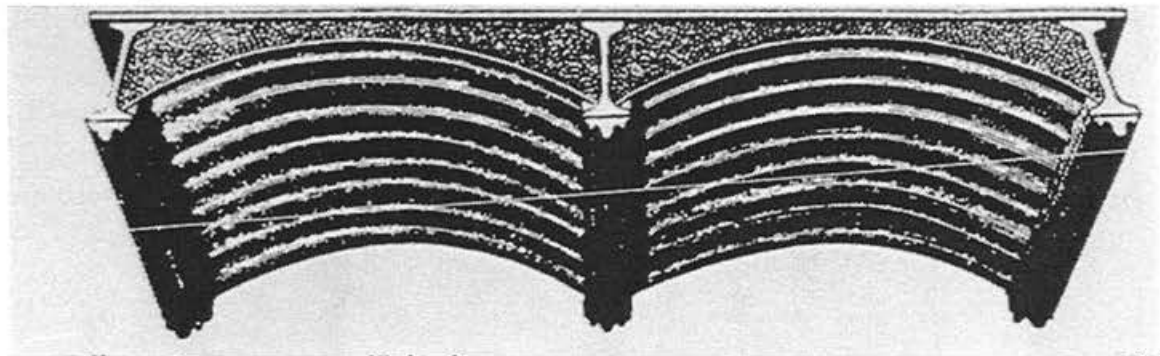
Floor system combining R.S.J.s, corrugated-iron arches and breeze concrete fill.
